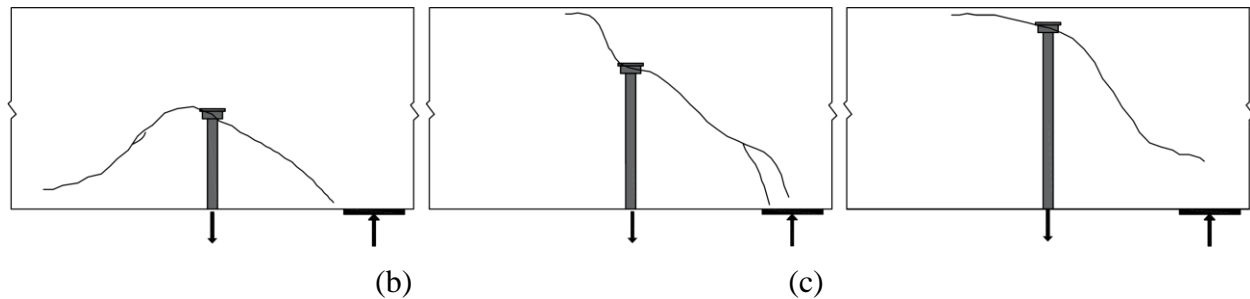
Failure Modes: (a) Concrete Breakout; (b) and (c) Joint Shear Failure [figure after Chun et al. (2009)]
